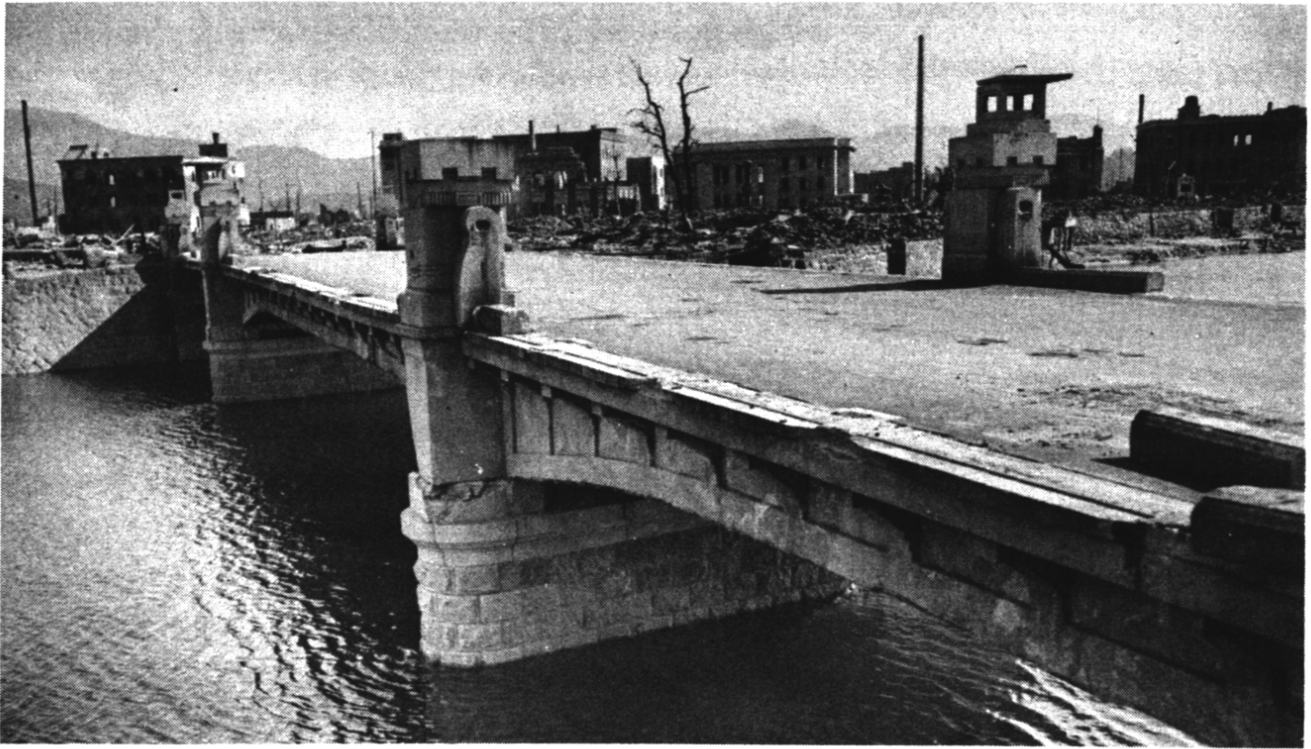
Bridge with deck of reinforced concrete on steel-plate girders; outer girder had concrete facing (270 feet from ground zero at Hiroshima). The railing was blown down but the deck received little damage so that traffic continued.
